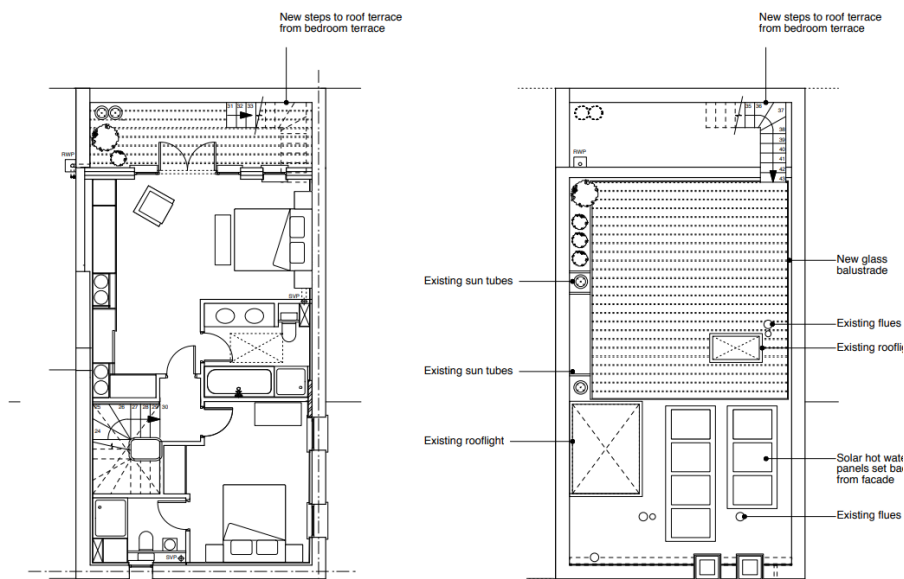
Floor plans for 1 King’s Mews (2014/3366/P) showing the external staircase from balcony to roof terrace.
